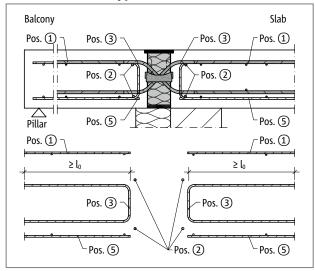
Schöck Isokorb® T type Q-E-VV5: Product layout
